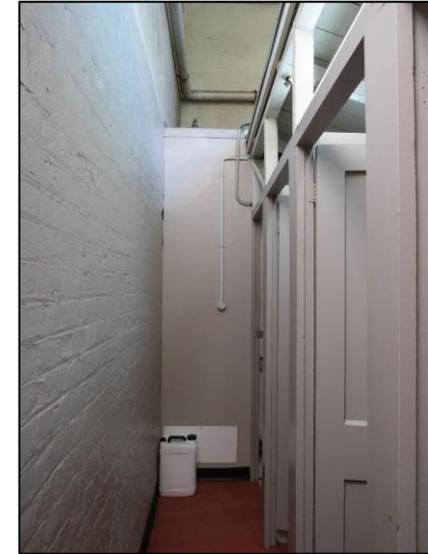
Room 16, interior of toilet block on ground floor, looking west. Note brick exterior wall.
